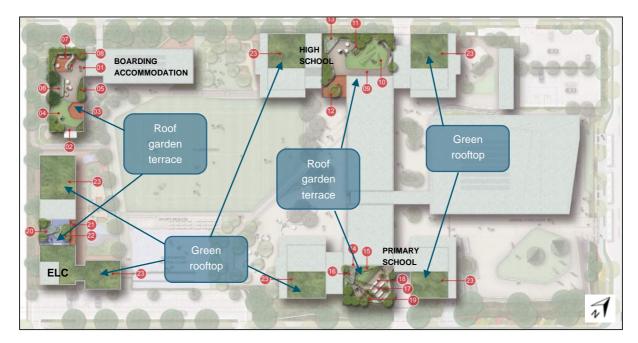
| Roof top (garden) terraces and green rooftops (Source Applicant's EIS 2019)
